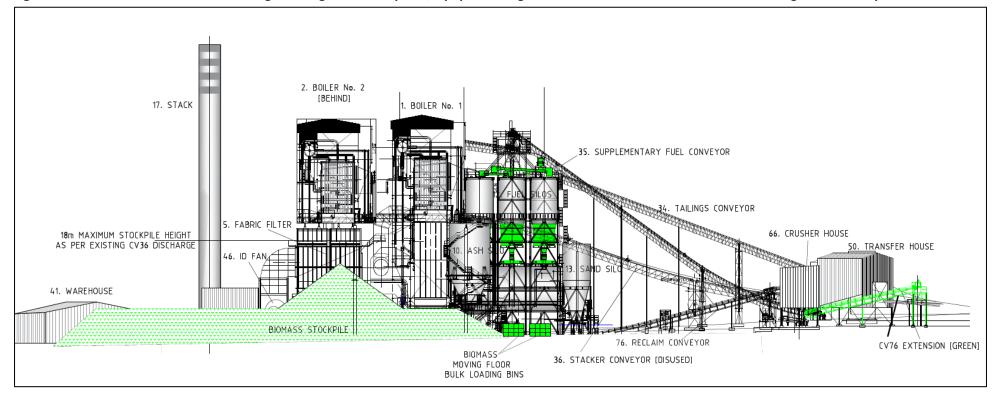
Biomass receival and handling showing additional plant/equipment in green. South elevation view. Refer to 0 for high resolution plan.
